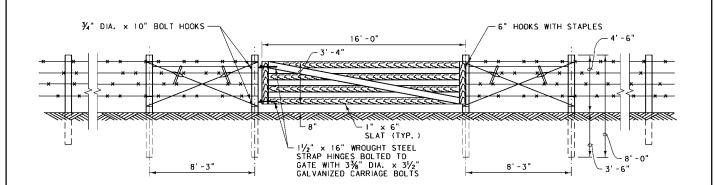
DETAILED DRAWING REFERENCE STANDARD SPEC. SECTION 607 DWG. NO. 607-15
